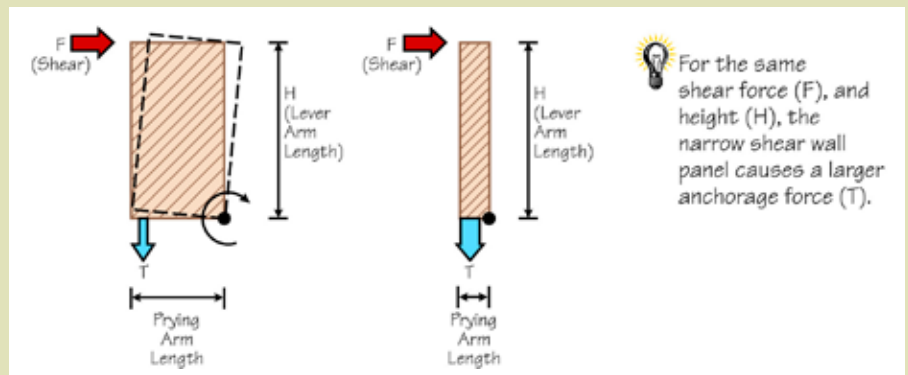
Illustration of increased anchorage forces for narrow shear wall panels.
